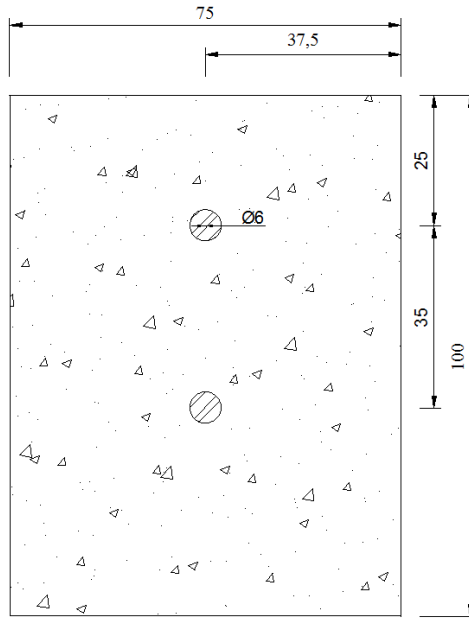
CROSS-SECTIONAL AREA OF BEAMS
